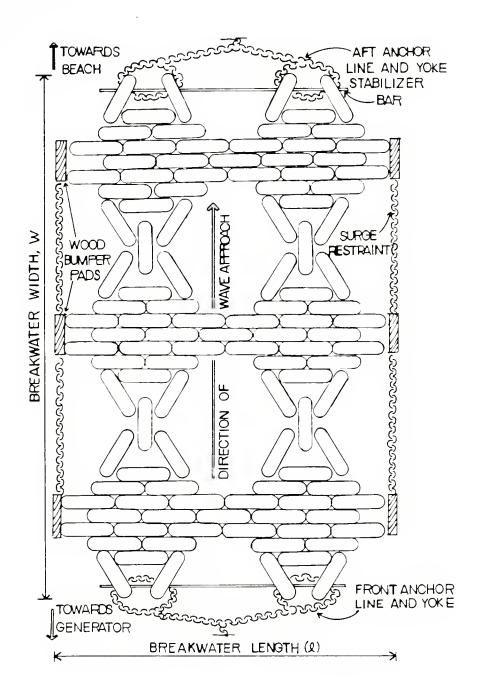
Plan View of Breakwater Test Section (3 Module Test)
